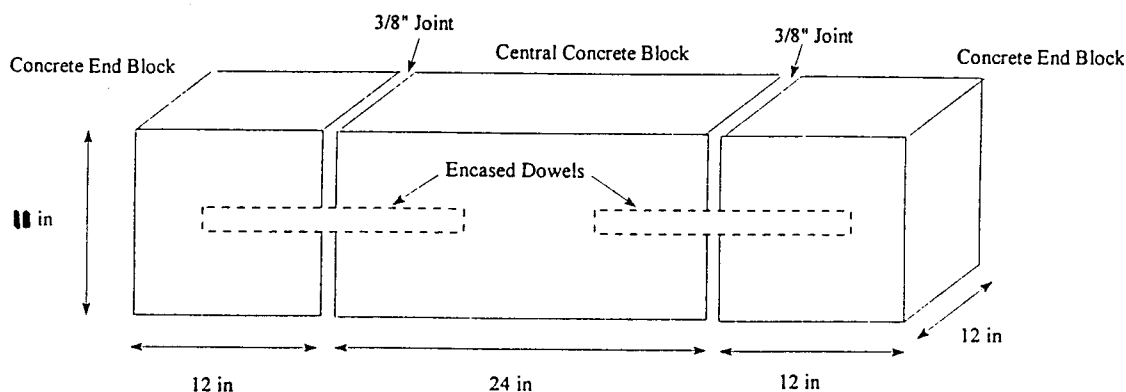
Schematic Illustration of Joint Deflection Test Specimens
